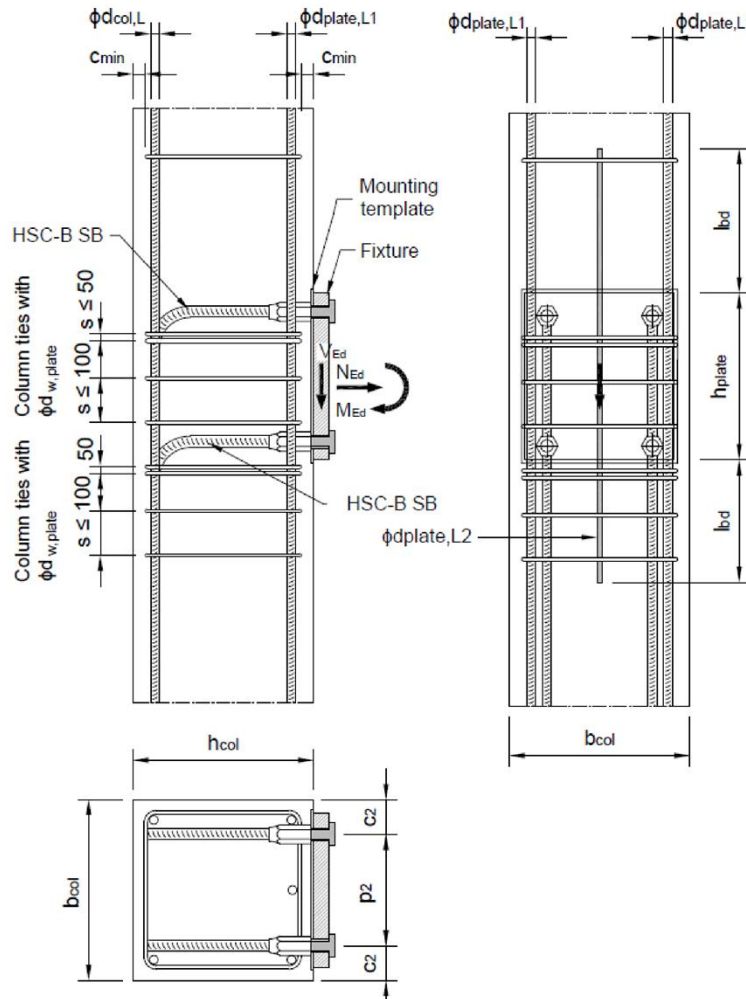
Dimensioning and detailing of bolted end-plate connections, anchorage of structural steelwork socket bars by lapping of bars
